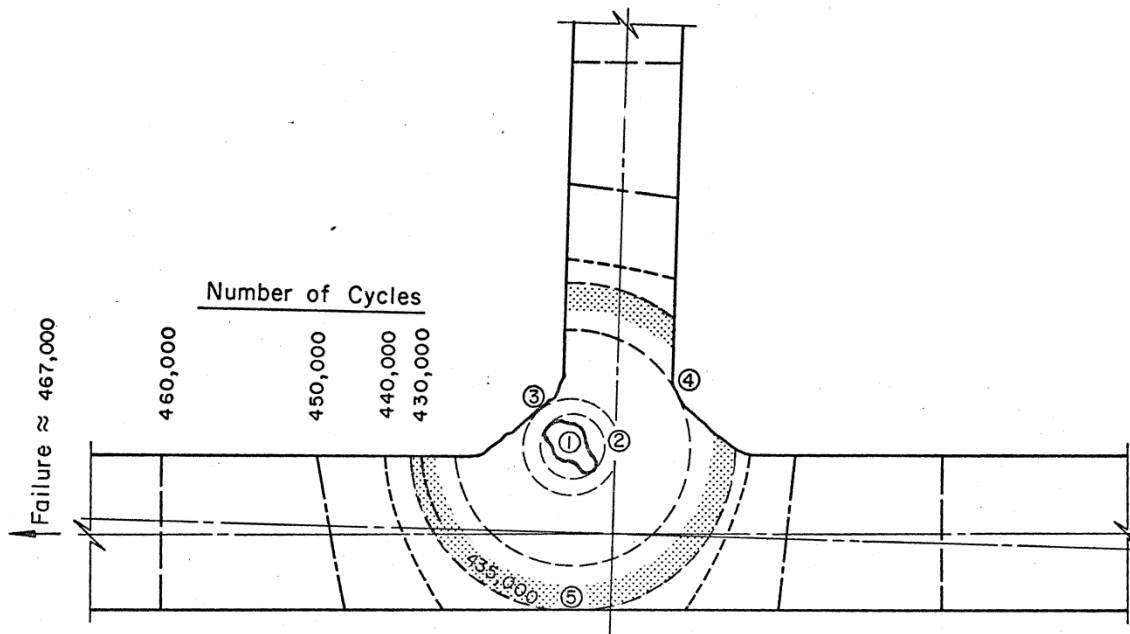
Number of cycles leading to failure in a steel girder.
